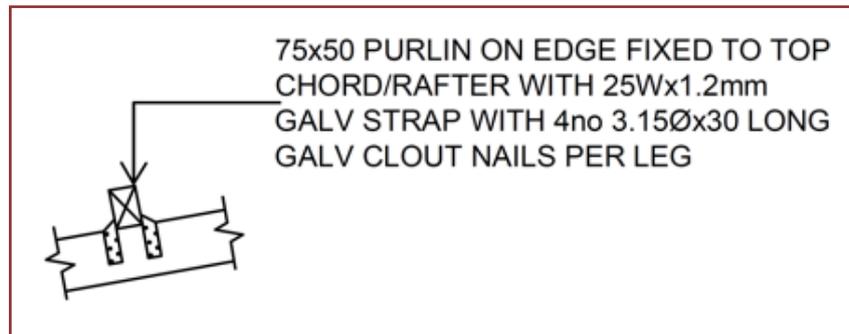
Connection of roof purlin to roof frame (Source: Fiji Rural Housing Unit standard drawings)
